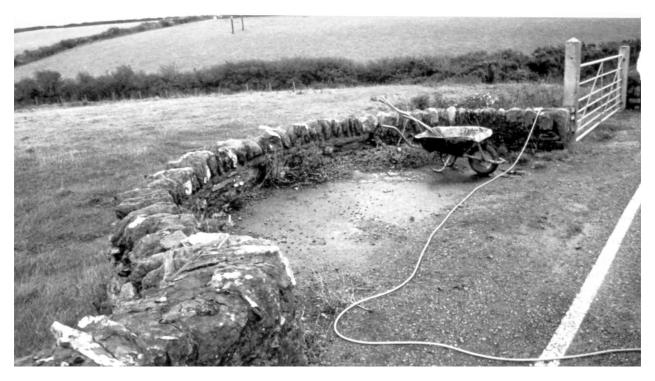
Semi-circular walled depot, west of Caergeiliog (OA North)
